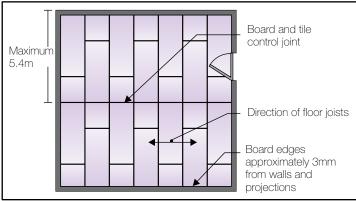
BOARD CONTROL JOINT LAYOUT
